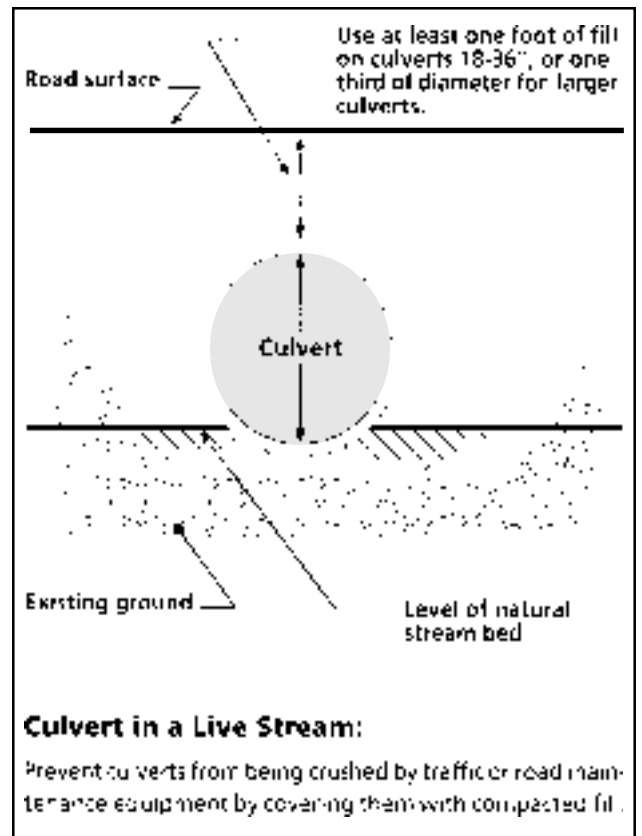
Culvert placement. Source: *Washington Dept. of Natural Resources publication "Forest Practices Illustrated."
